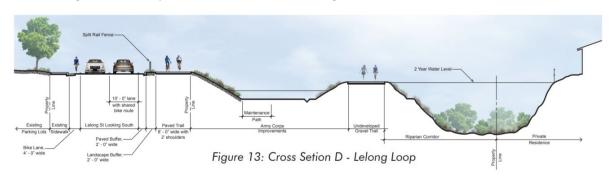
Guadalupe River Trail Cross Section at Lelong Street
